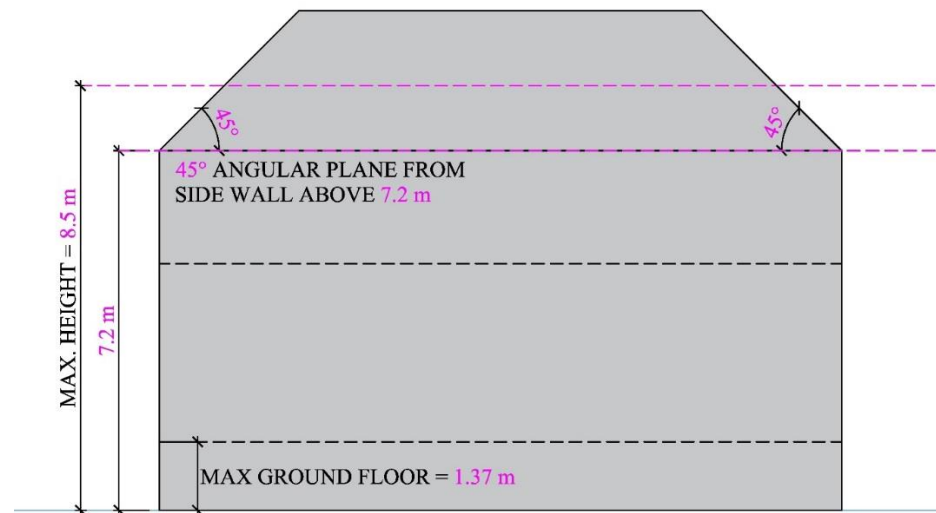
K.F9: Parallel Massing on Pitched Roof Building – Side Elevation
